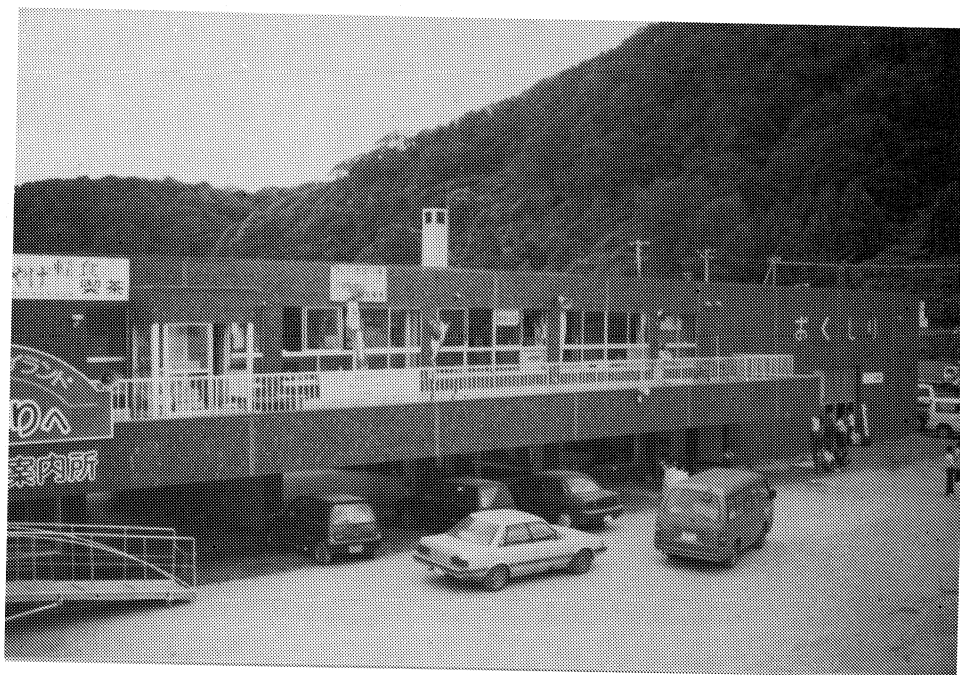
The reinforced concrete-frame Ferry Building in Okushiri. The ground-floor finishes were extensively damaged by the tsunami. The building had some damage due to local settlement in one corner.
